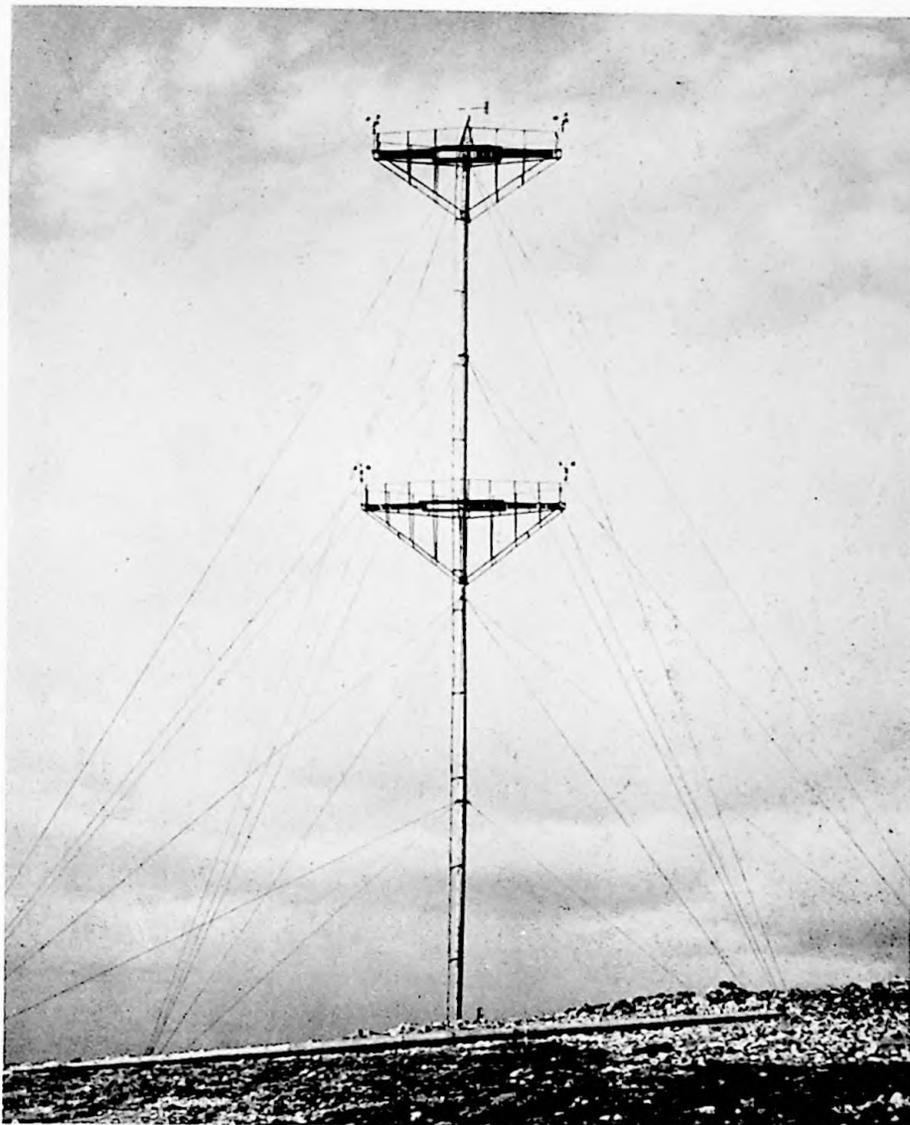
(a).—66-ft. tubular steel mast installation—Mynydd Anelog, North Wales.
